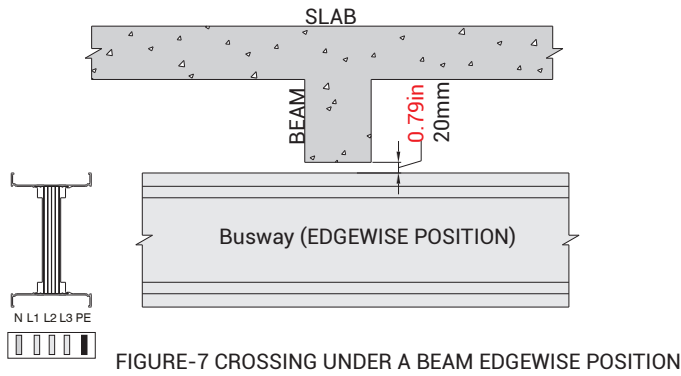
CROSSING UNDER A BEAM EDGEWISE POSITION
